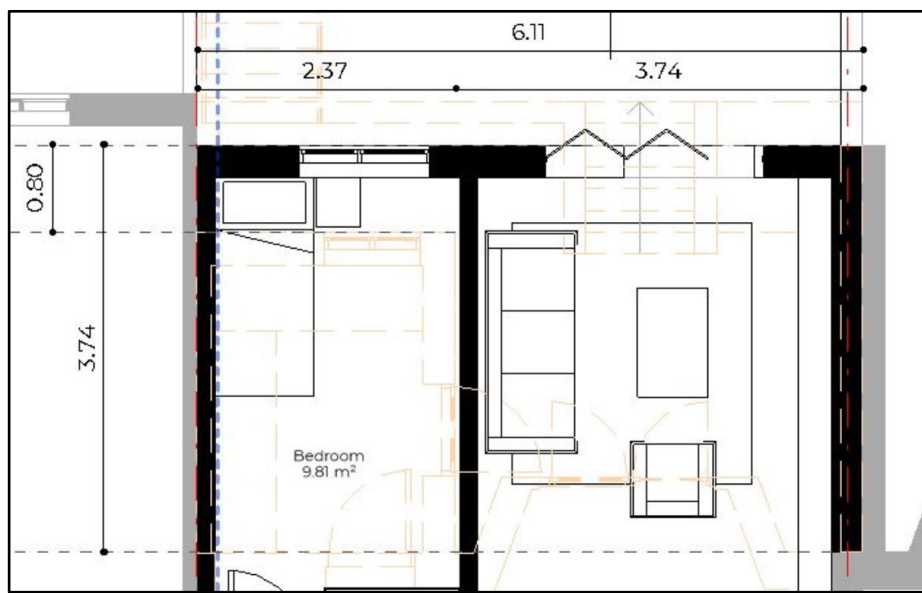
The Proposed Lower Ground Floor Extension to 83 St Augustine's Road
